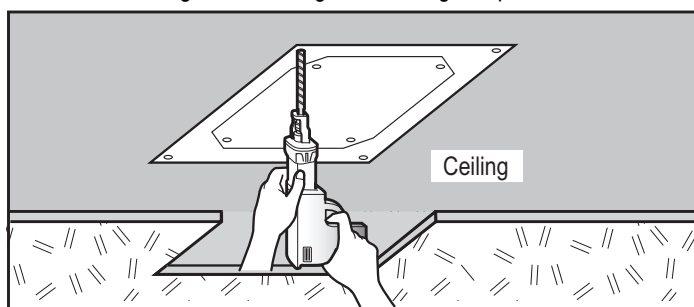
Ceiling Opening Dimensions and Bolt Locations.
